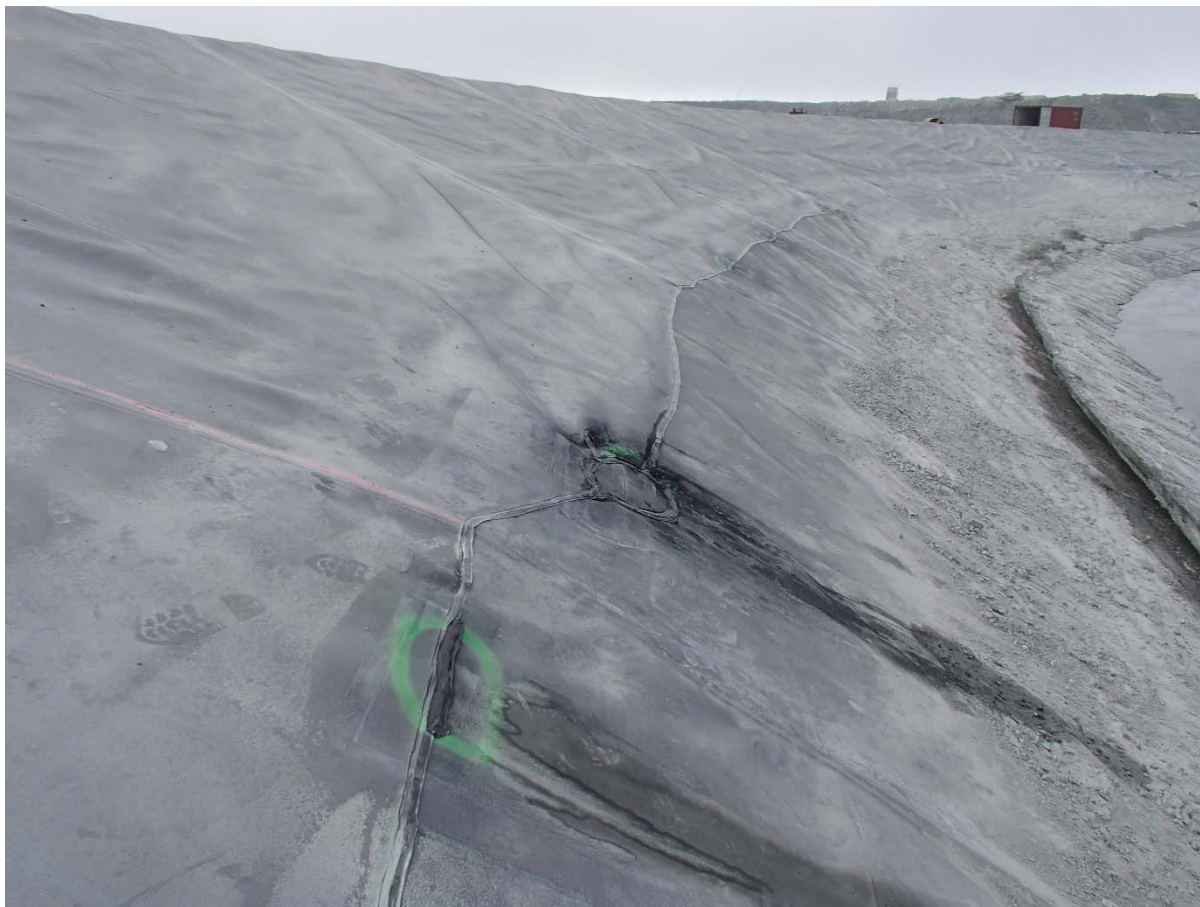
From Sta. 0+310/-26 m, looking N. View of the extrusion welding.
